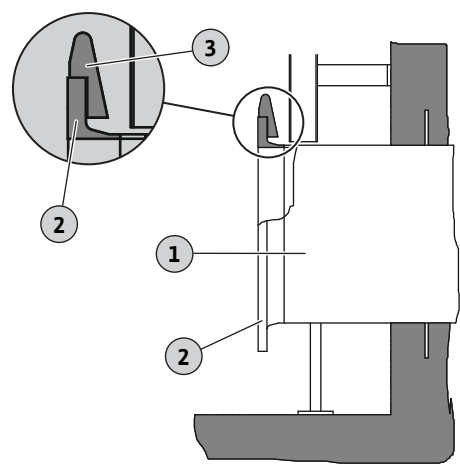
Pressure wedge: Discharge pipe with weld neck flange
